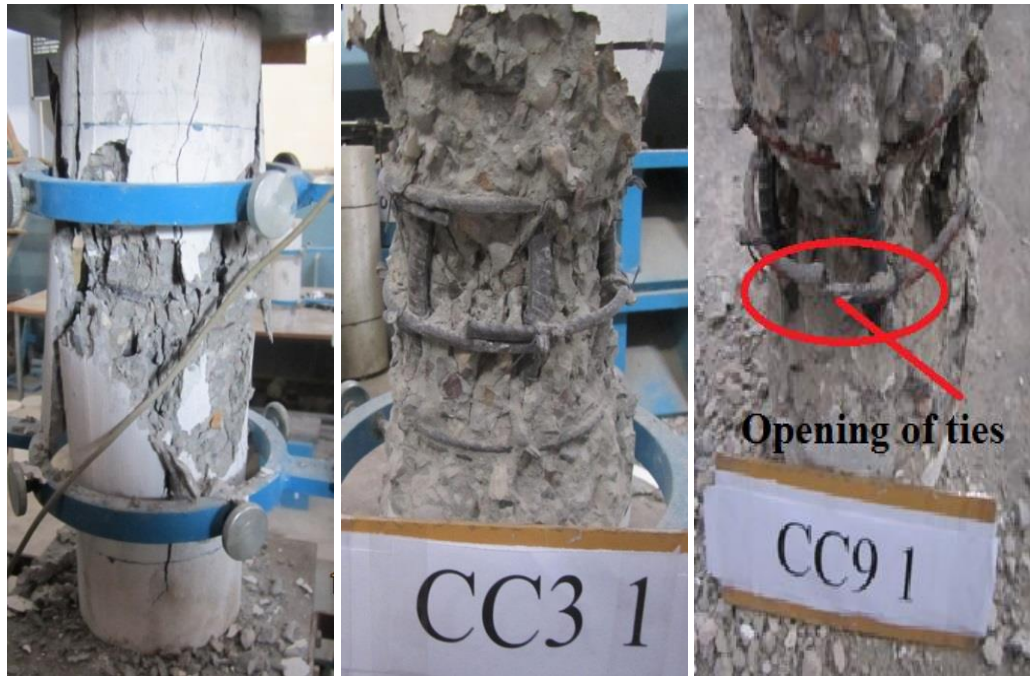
Buckling of rebars, opening if ties and crushing failure of control and heat damaged specimens
